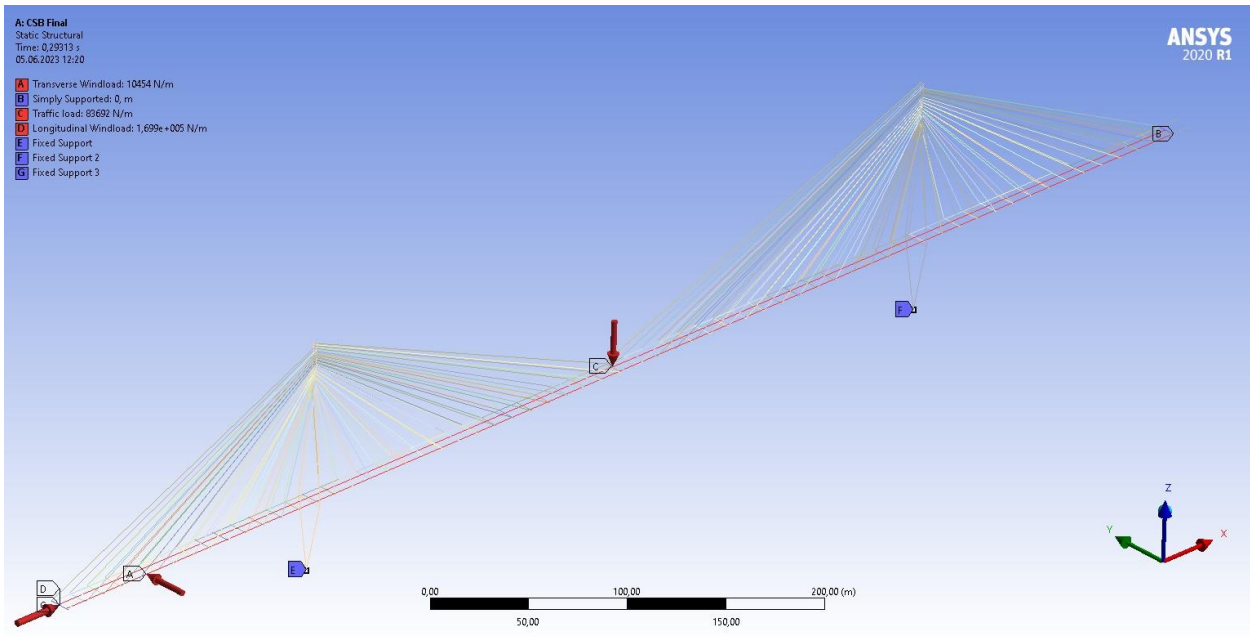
Static structural view of the bridge with the supports and forces applied on elements of the bridge
